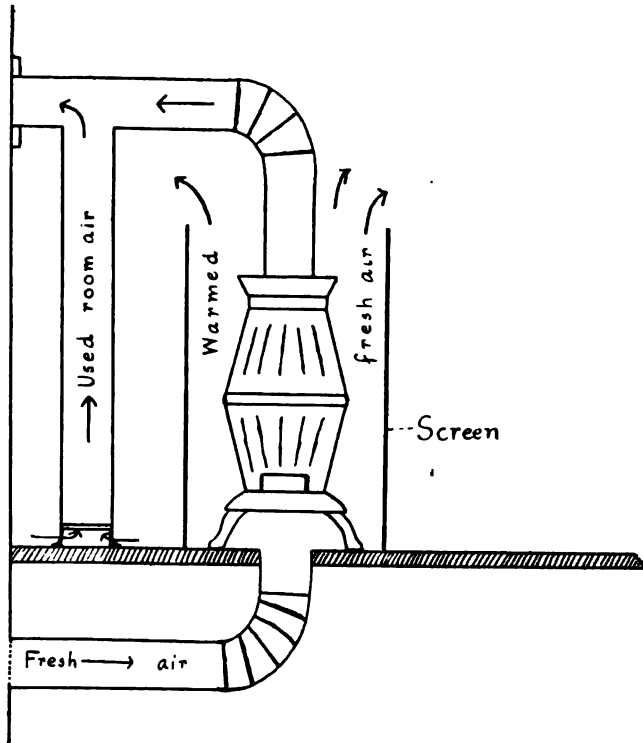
Jacketed stove; the fresh air inlet may be cut through the wall directly. A floor inlet is better when the stove is some distance from the outside wall. Notice that the outlet for used air connects with the stovepipe; this helps draw out the used air.
